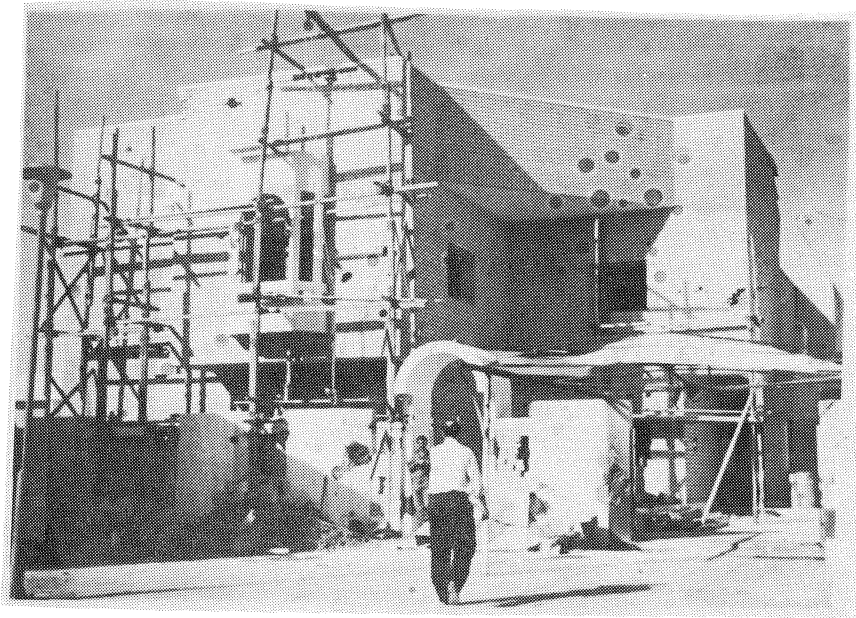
Cladding System shows Remarkable Resistance to Shelling
